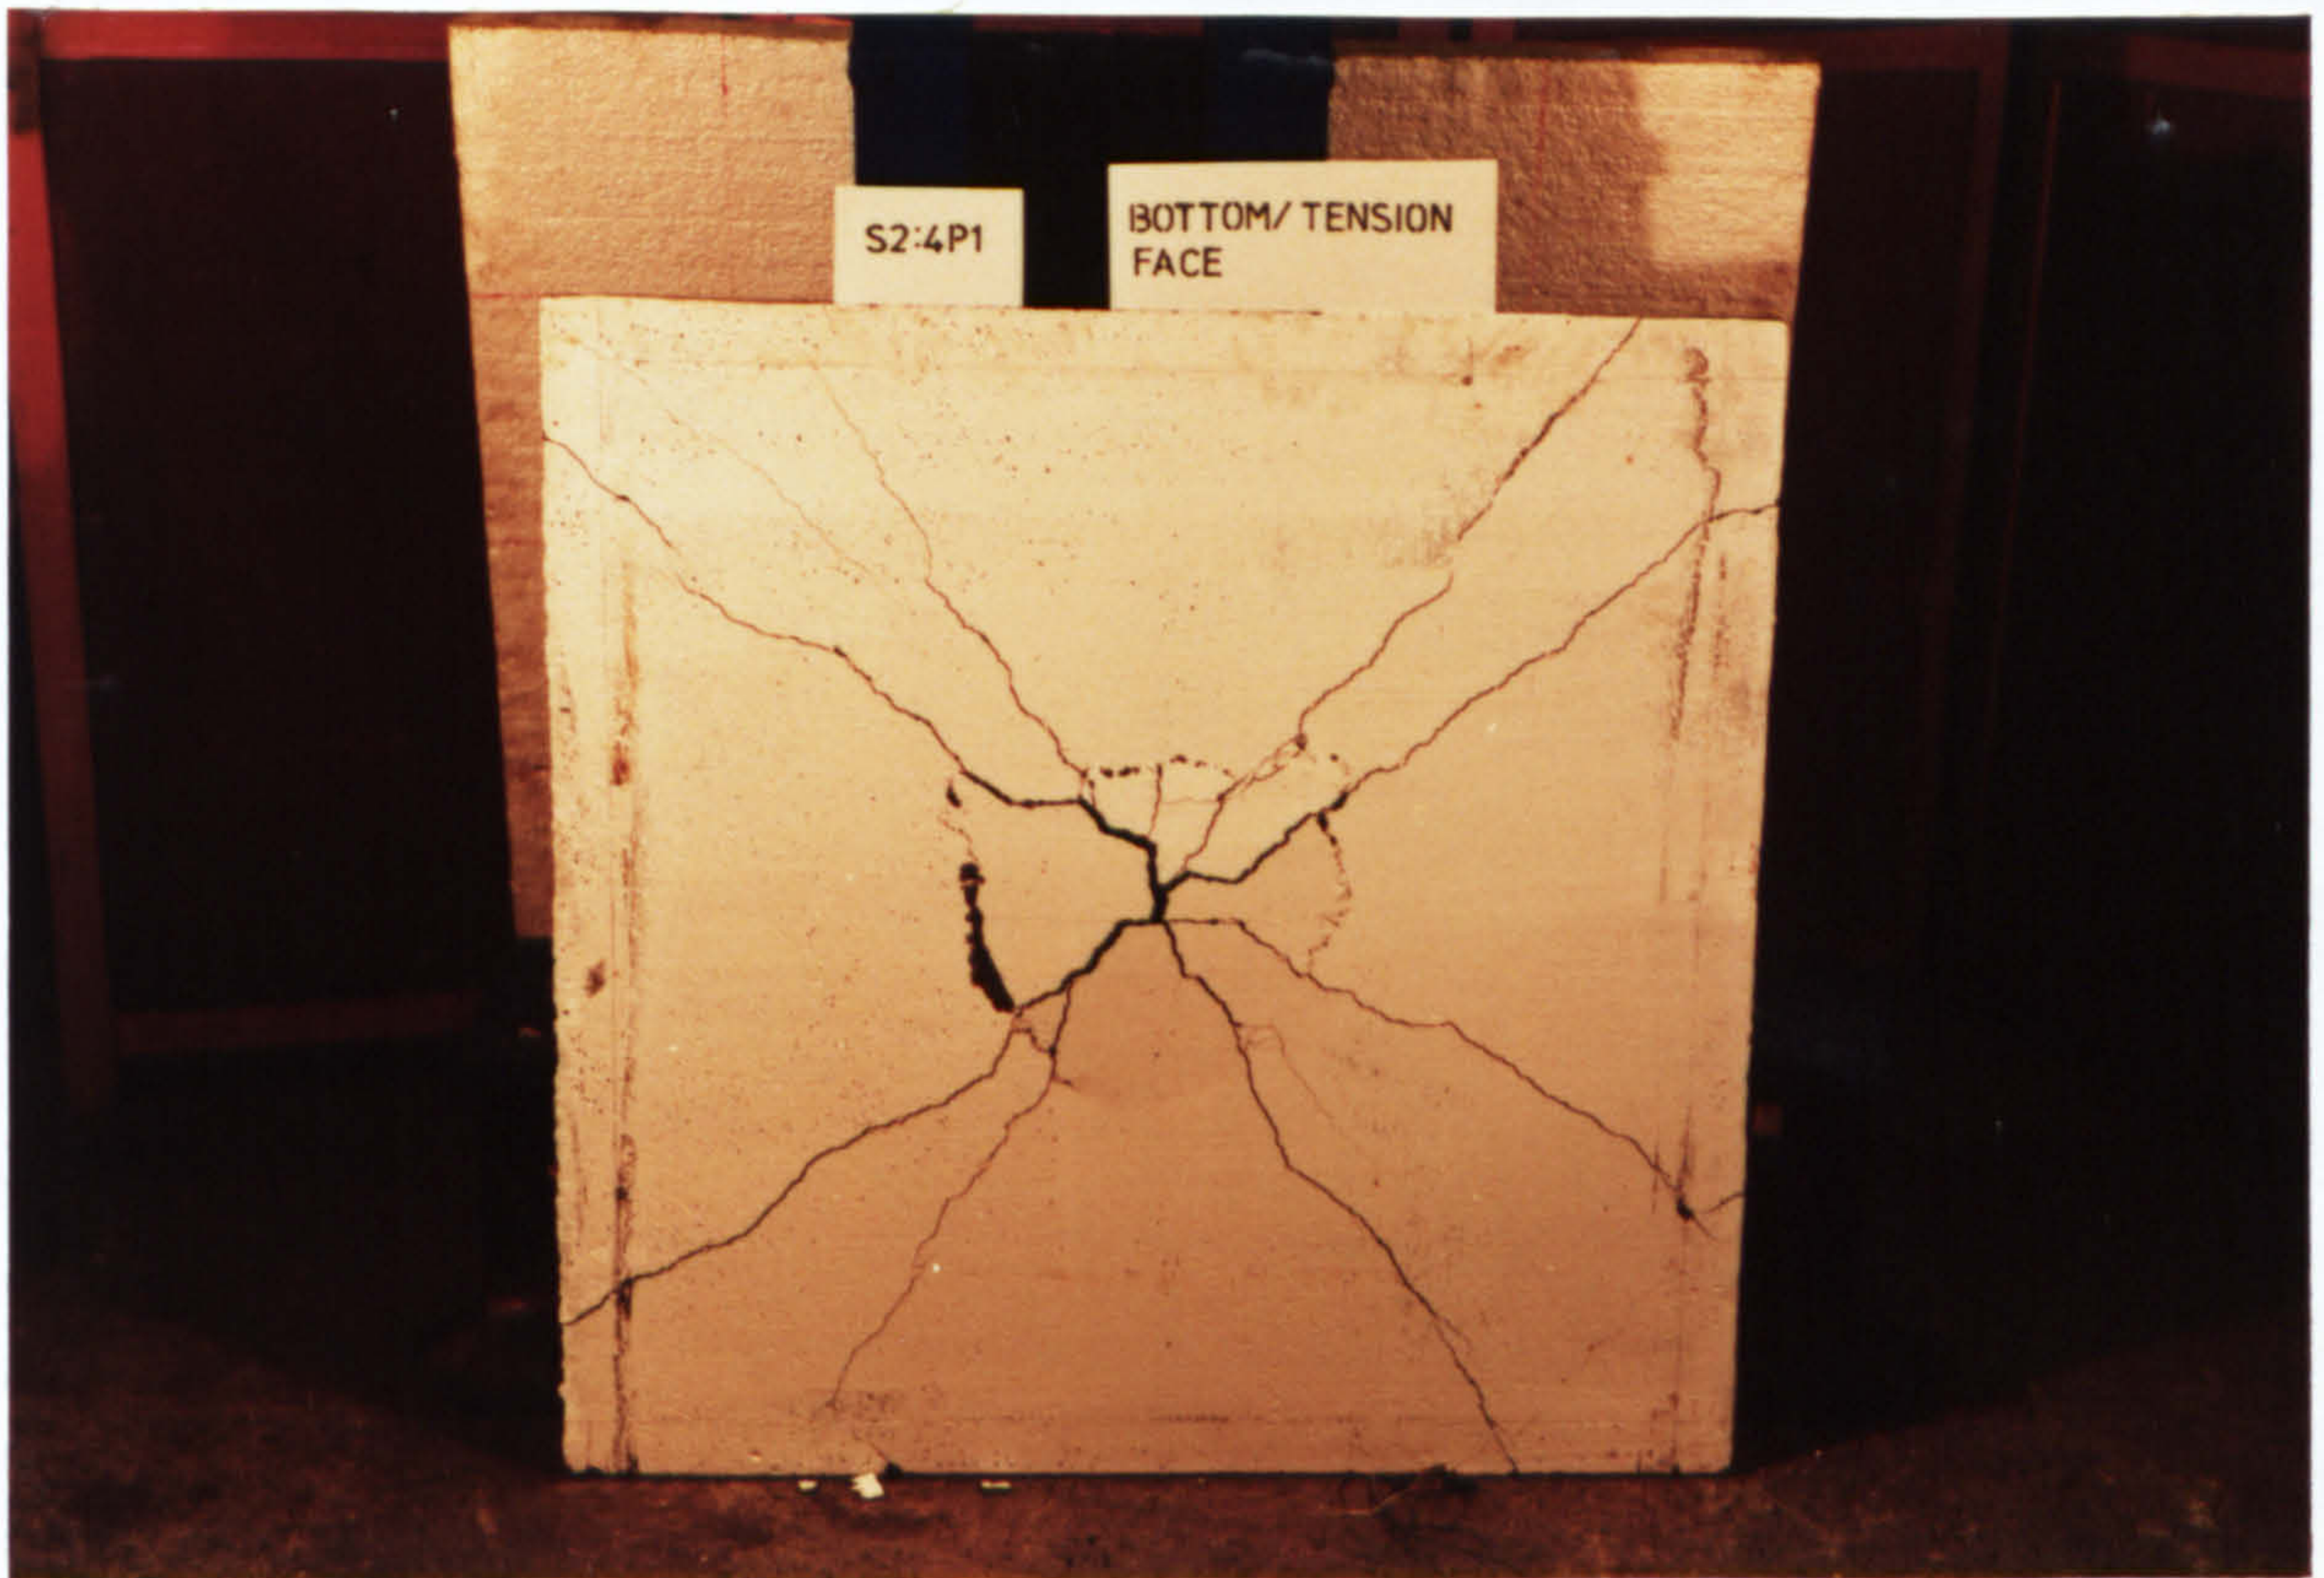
Crack Patterns at Failure on the Tension Face of Model S24P1.
